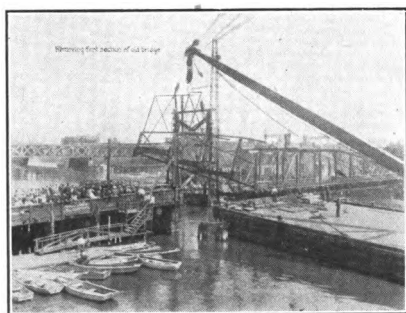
Removing old swing span. Washington St. Bridge, Norwalk, Conn.
